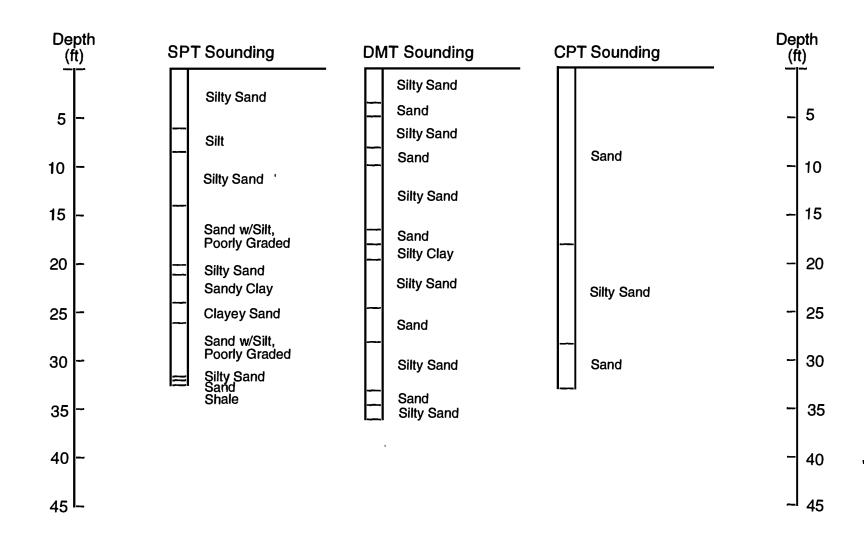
Soil Profile Based on In Situ Testing at Abutment B2
